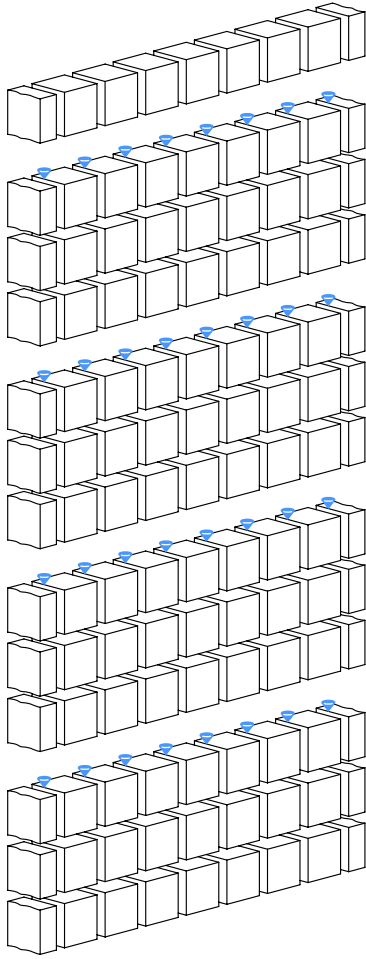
Positioning of In-Rack Sprinklers in
